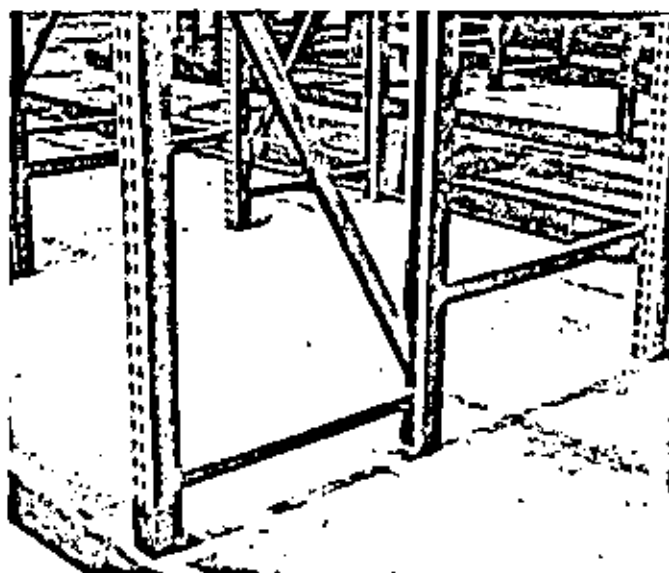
Loaded legs supporting high-rack storage must have base plates of adequate size to prevent bearing or shear failure in the slab.
